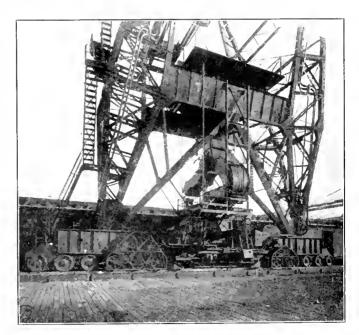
Loading Plant and Trucks at Shear End of North Western Fuel Company's Bridge No. 5, Dock No. 1, Superior
